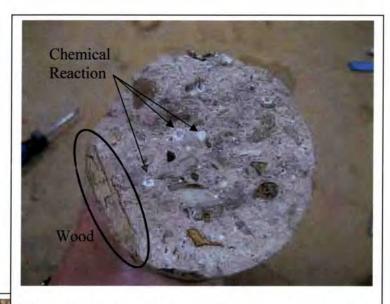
Core 2, Segment 6 - Cross section showing wood and chemical reaction in concrete (efflorescence).
